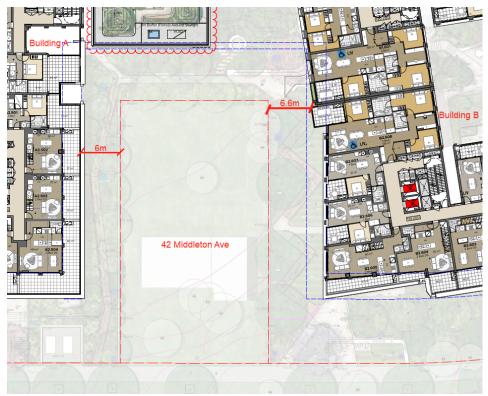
Level 6 Floor Plan indicating separation distance to 42 Middleton Ave
